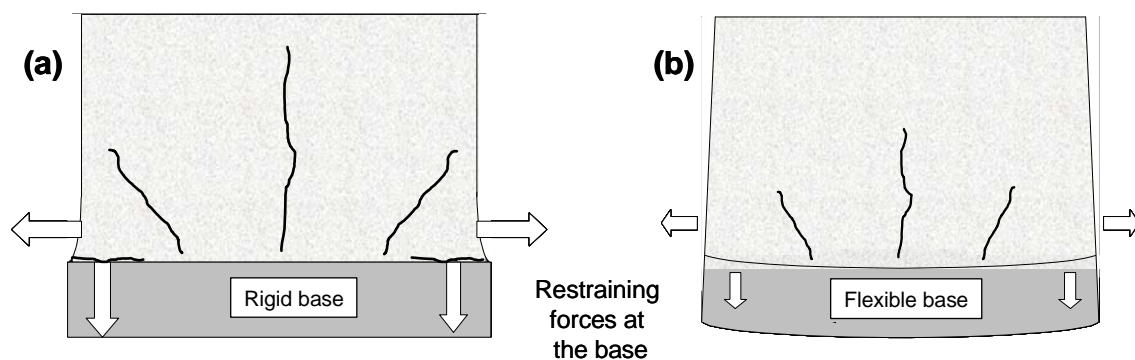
Restraining forces and cracking in a wall cast onto a base
